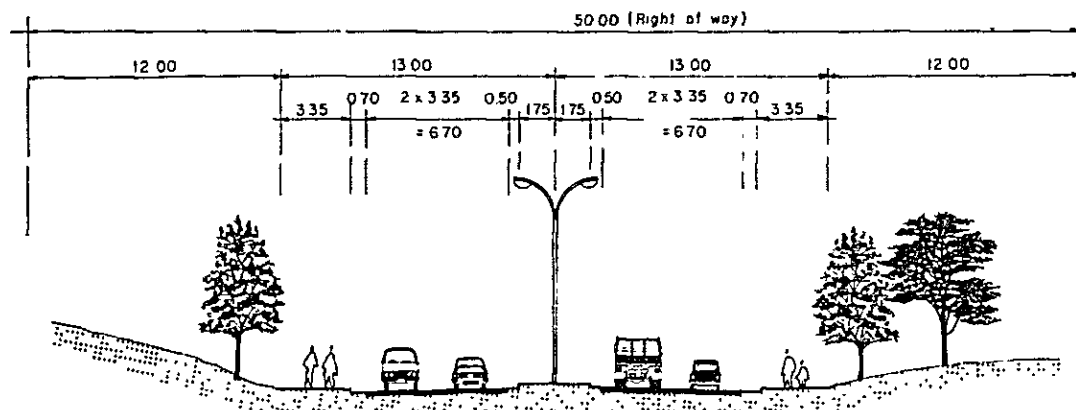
TYPICAL CROSS SECTION OF VIA EL PAICAL EXTENSION
